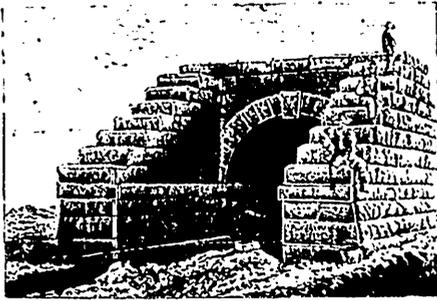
CULVERT UNDERNEATH EMBANKMENT.
